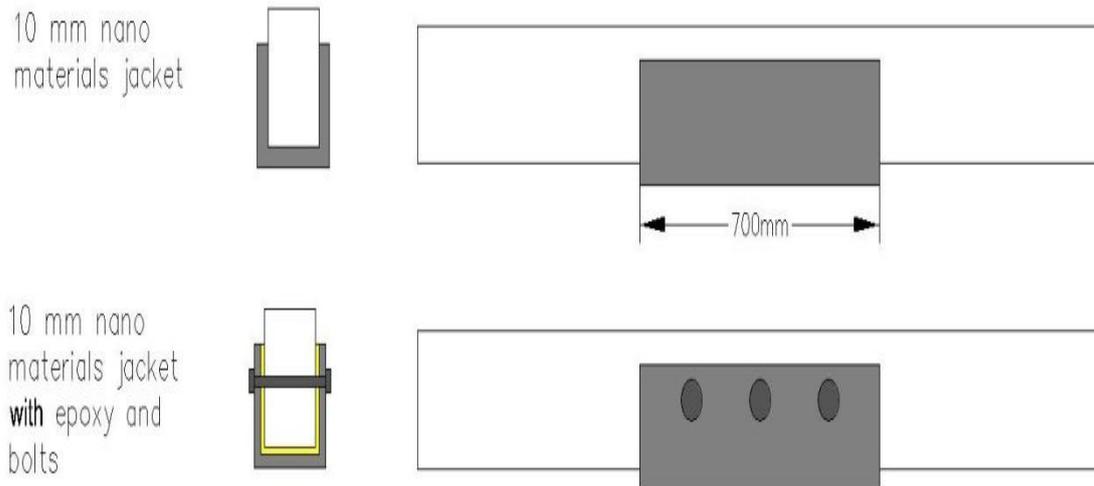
methods of fixing sections made from the developed nano ferrocement.
